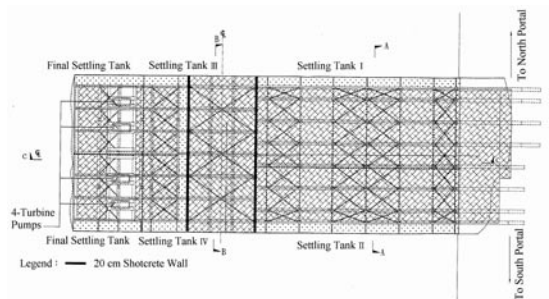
The Plane of Deck Platform in the Exhaust Air Ventilation Cavern
